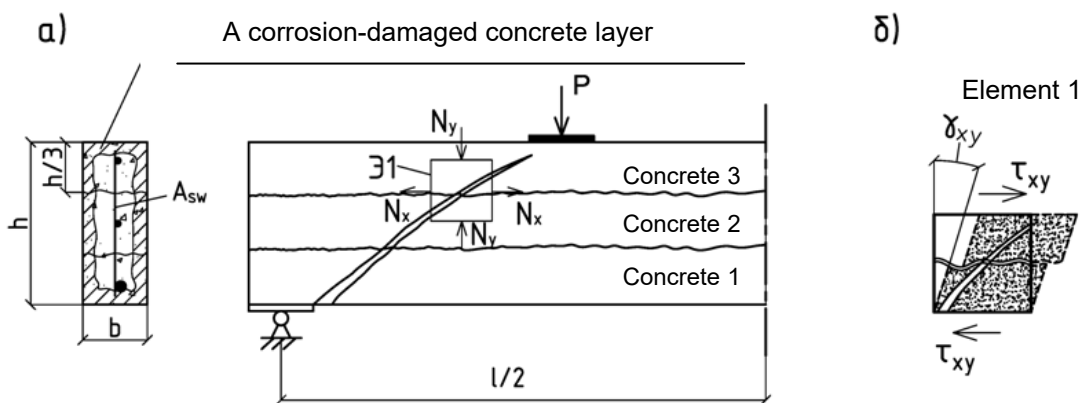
Scheme of a corrosion-damaged ferroconcrete composite (wall-beam) (a) with a typical deformed finite element identified in the contact area (b): h, b is the height and width of a ferroconcrete beam; l is the length of the beam; τ_{xy} are shearing forces in a typical element E1
